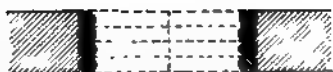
Primitive doorway. Elevation and plan. First stage.
